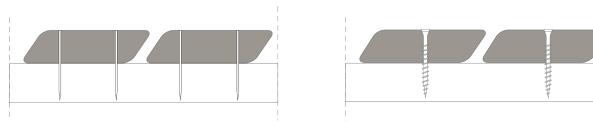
Fastening using headless nails Pav. 5: Fastening using wood screws
